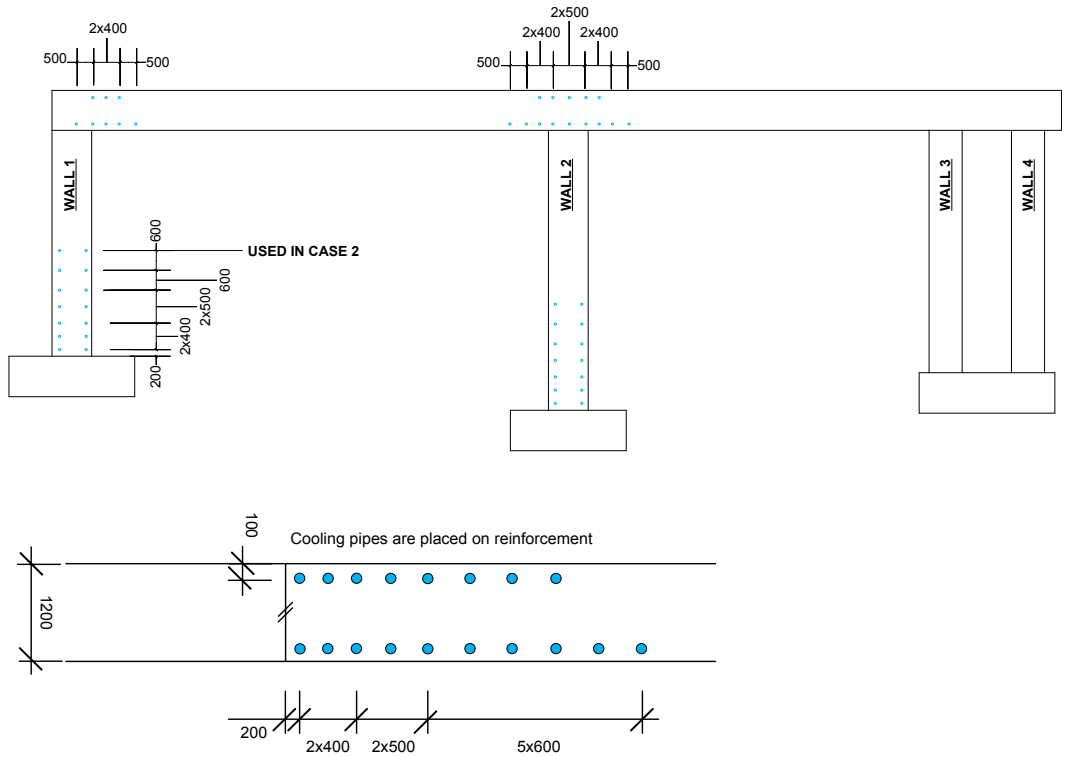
Positions of used cooling pipes. The upper figure shows the cooling pipes above the joint to walls while the lower figure shows the cooling pipes to adjoining roof segment. Pipes over wall 3 and 4 are not shown.
